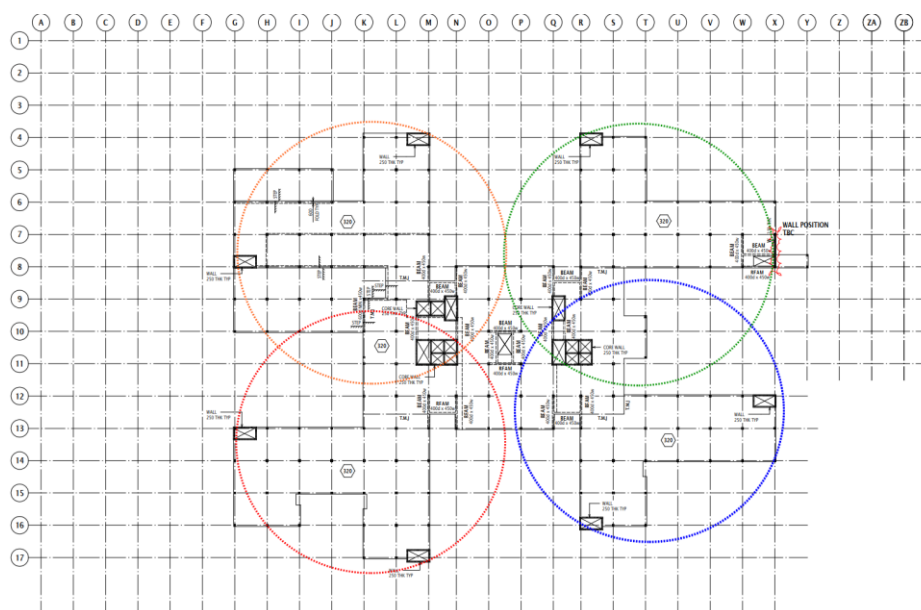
Approximate layout of Concrete Placing Booms.
